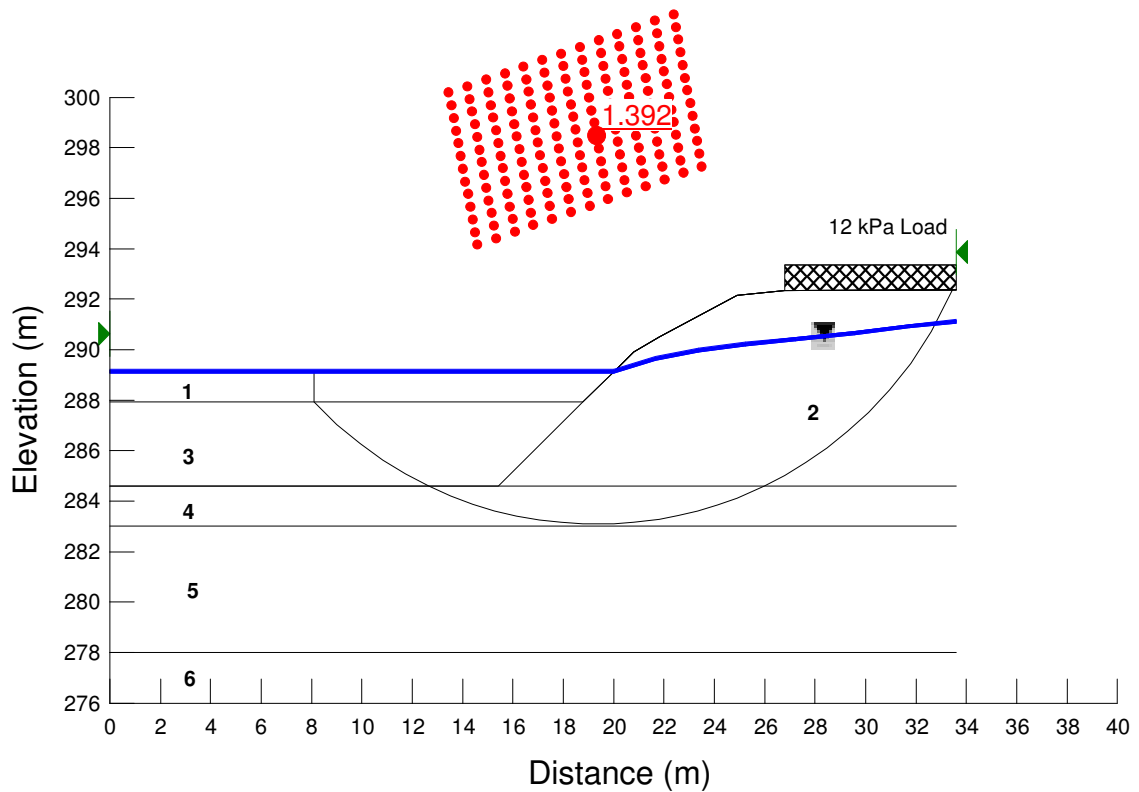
Stability of HWY11 Road Section at Sta. 14+900
